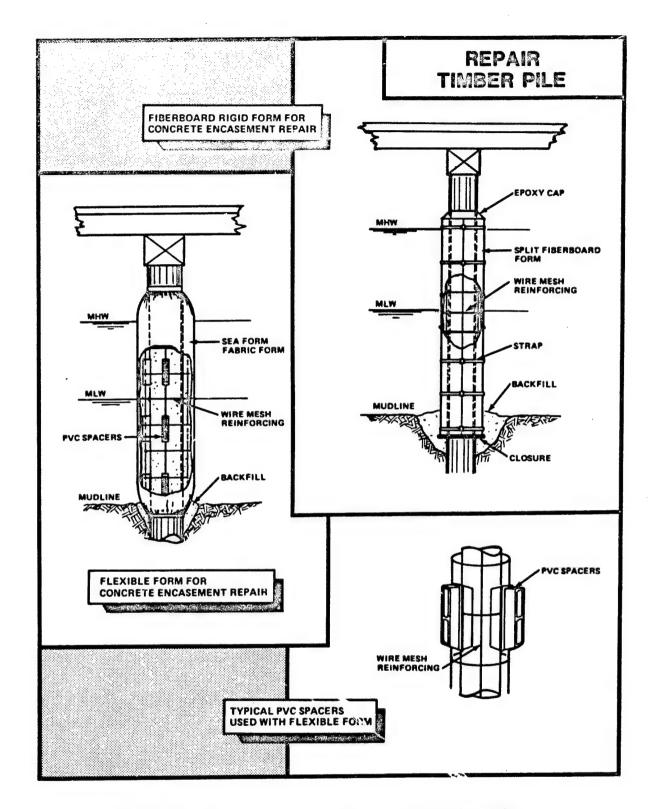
Concrete Encasement Repairs to Timber Pile.
